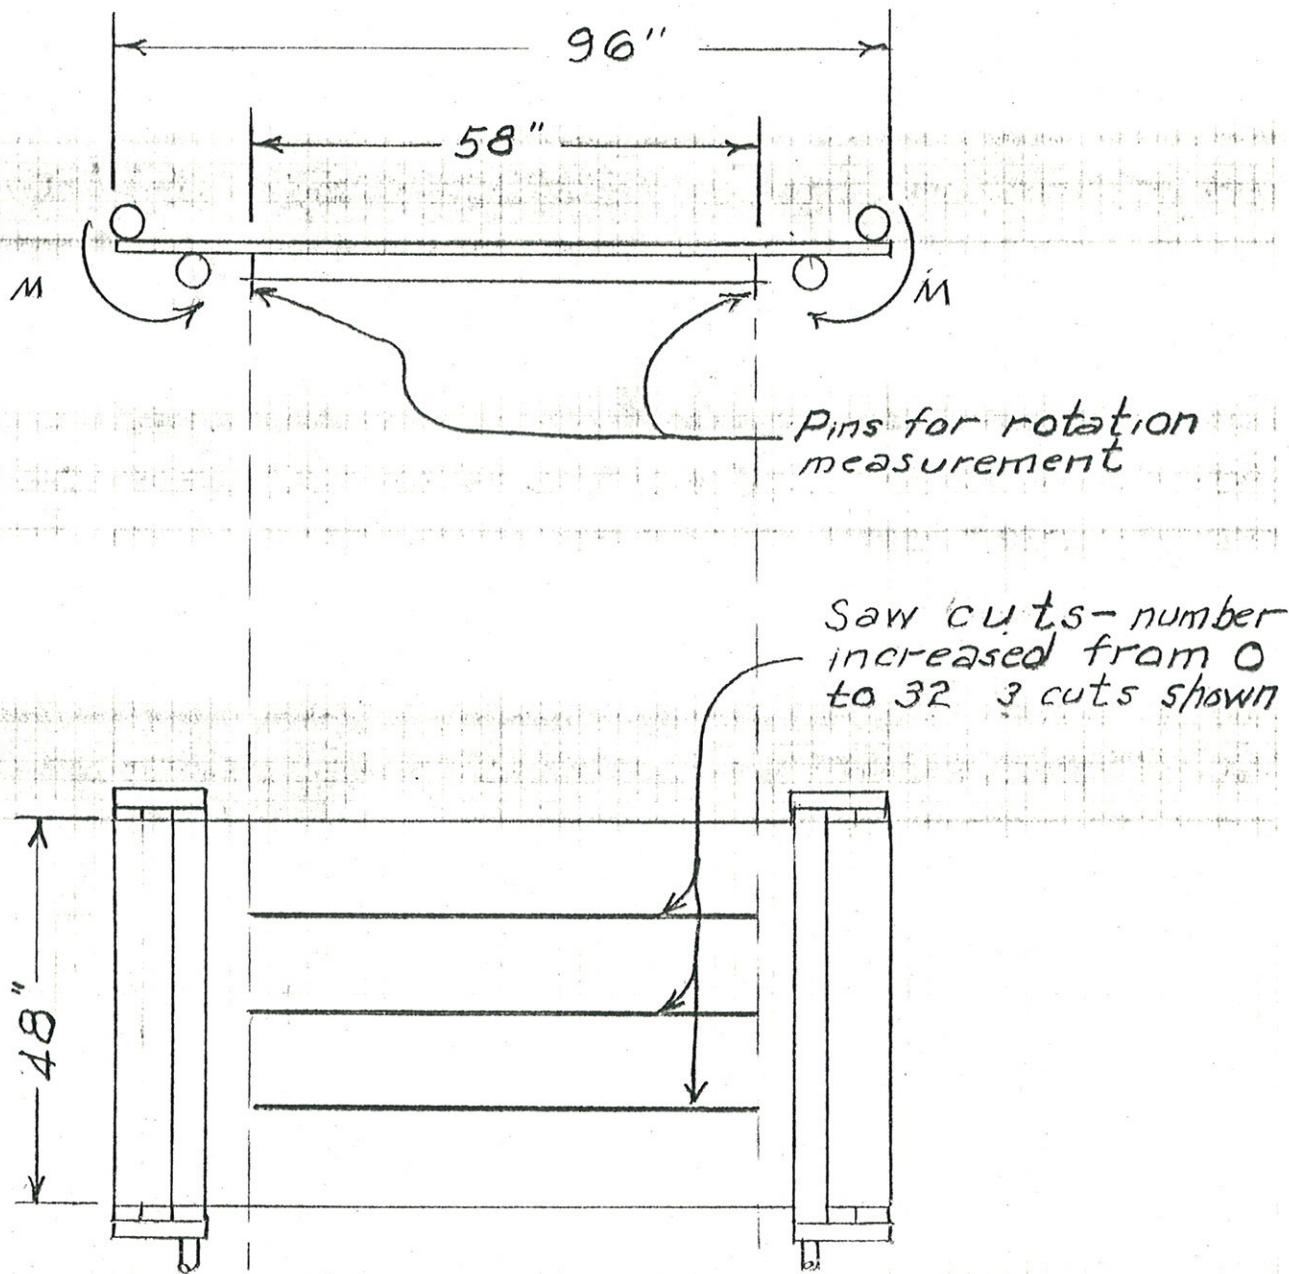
Layout and loading of test panels used to evaluate edge effects on bending stiffness.
